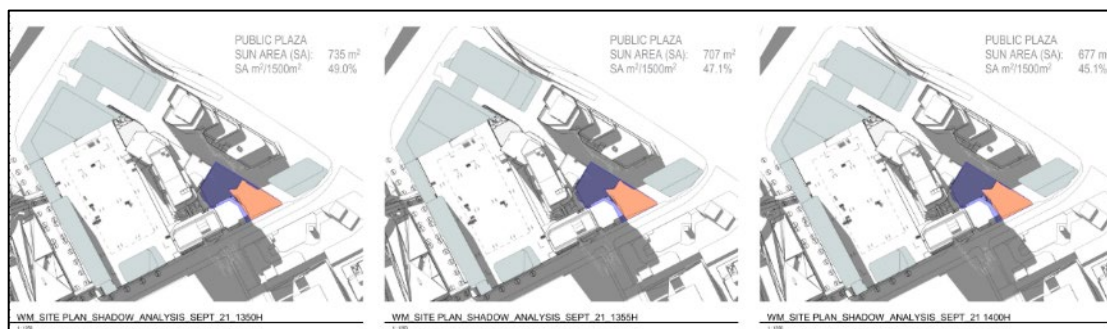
Extract from the submitted shadow analysis demonstrating the extent of overshadowing in purple of The Plaza between 1:50pm and 2pm (source: Architectural Plans)
